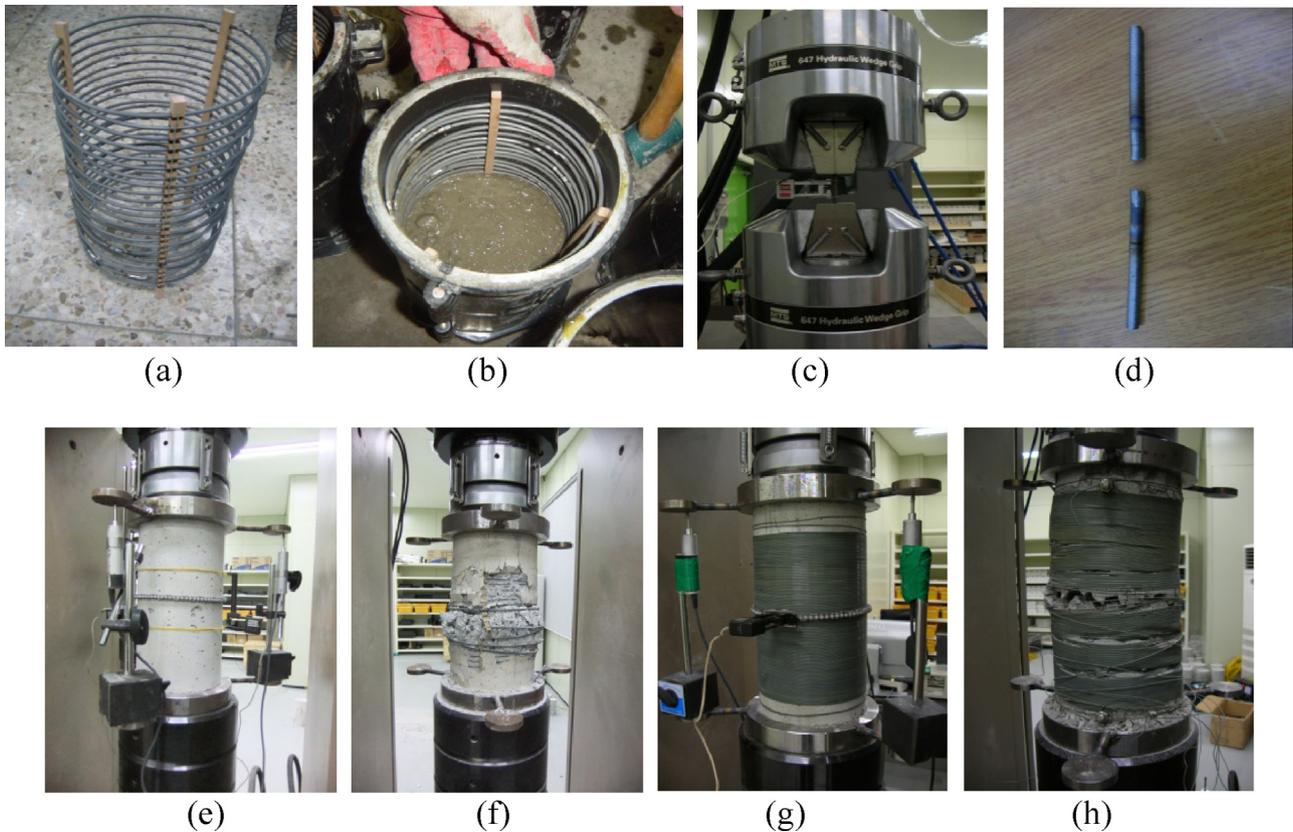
(a) The suite of SMA rings. (b) SMA rings in a mold. (c) Tensile test of a welded SMA bar. (d) Fracture of a welded SMA bar. (e) Test set-up for a cylinder with SMA rings. (f) Failure of a cylinder with SMA rings. (g) Test set-up for a cylinder confined by a SMA wire jacket. (h) Failure of a SMA wire jacketed cylinder.
